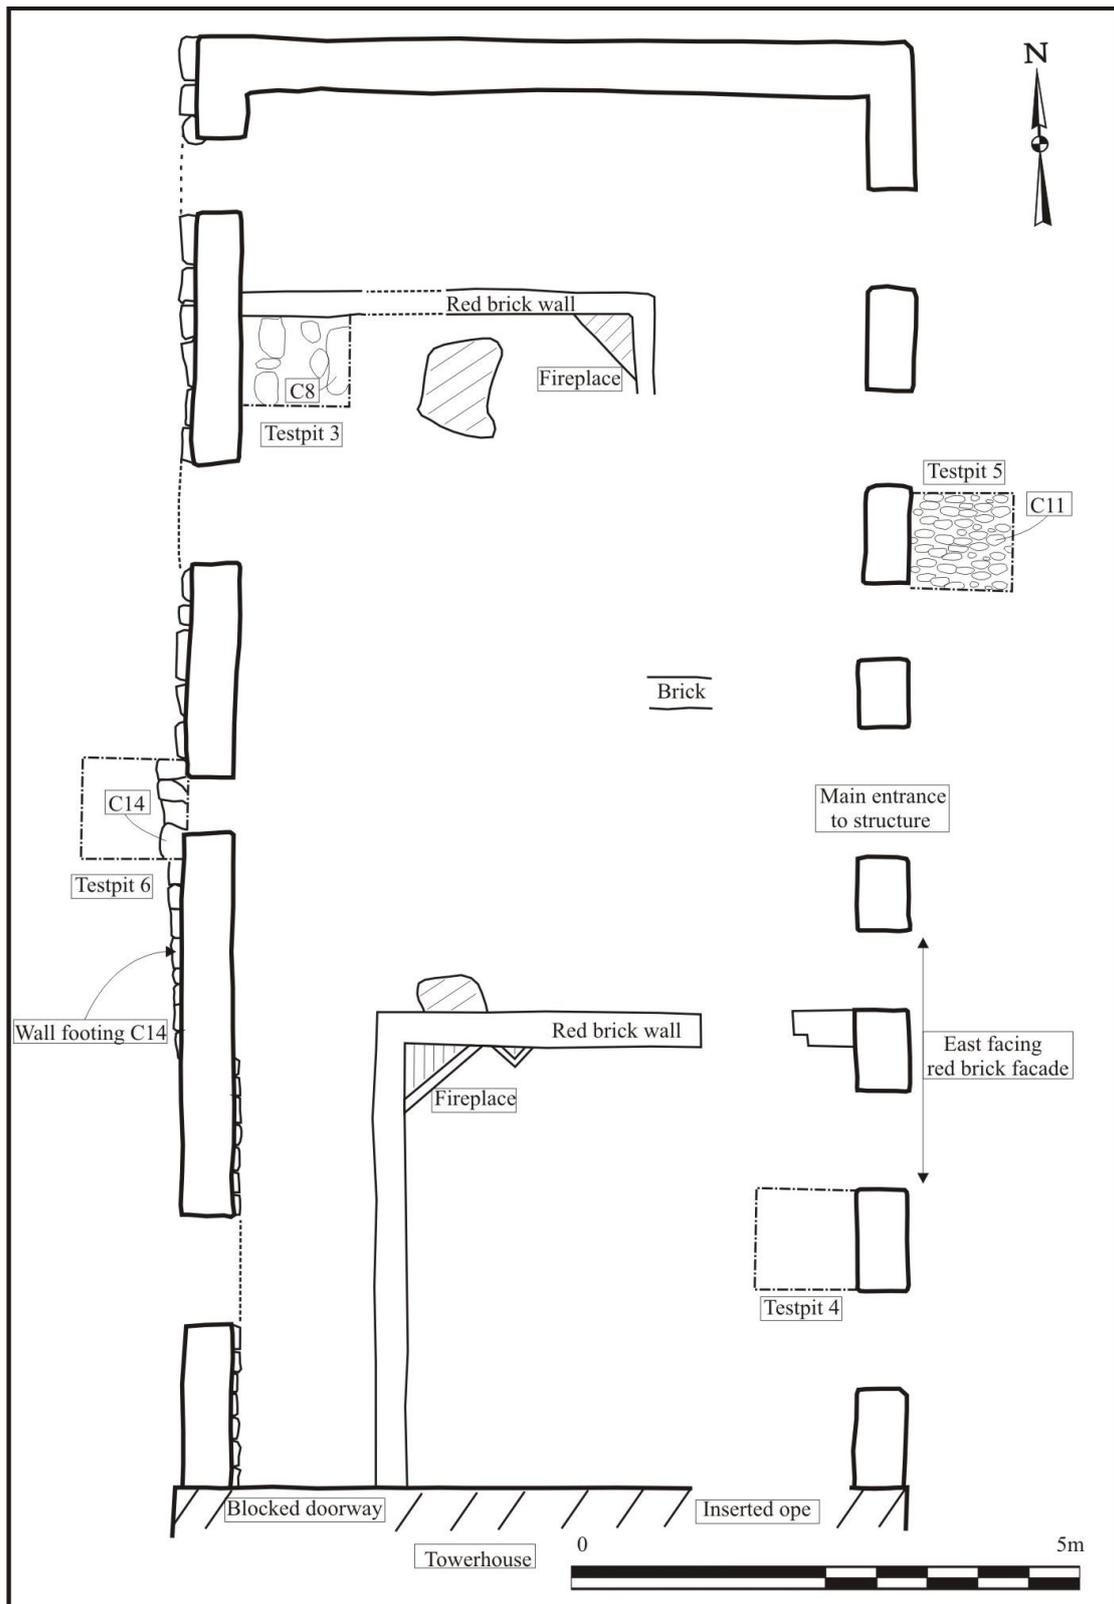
Layout of attached house showing position of test pits 3-6, and location of internal features at ground level.
